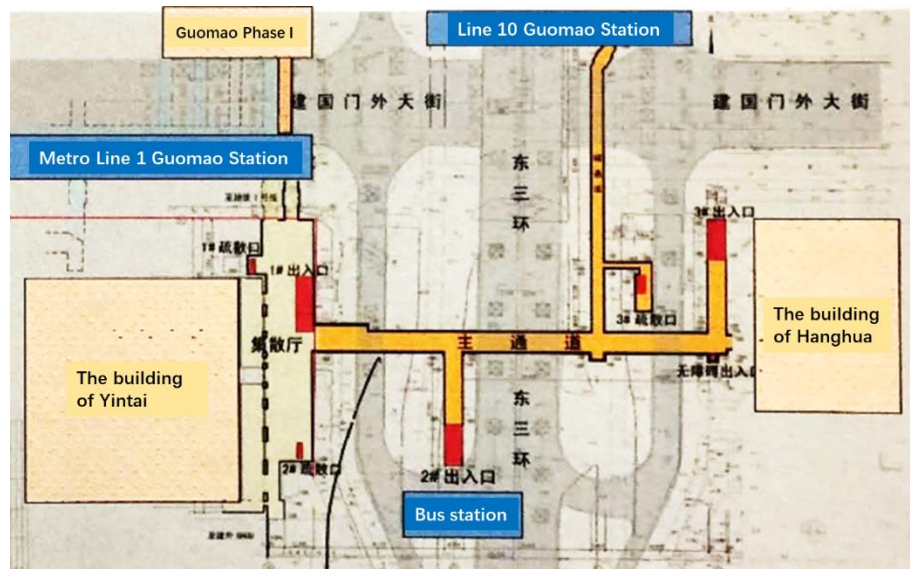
The Yintai-Hanghua underground pass way of Beijing CBD
